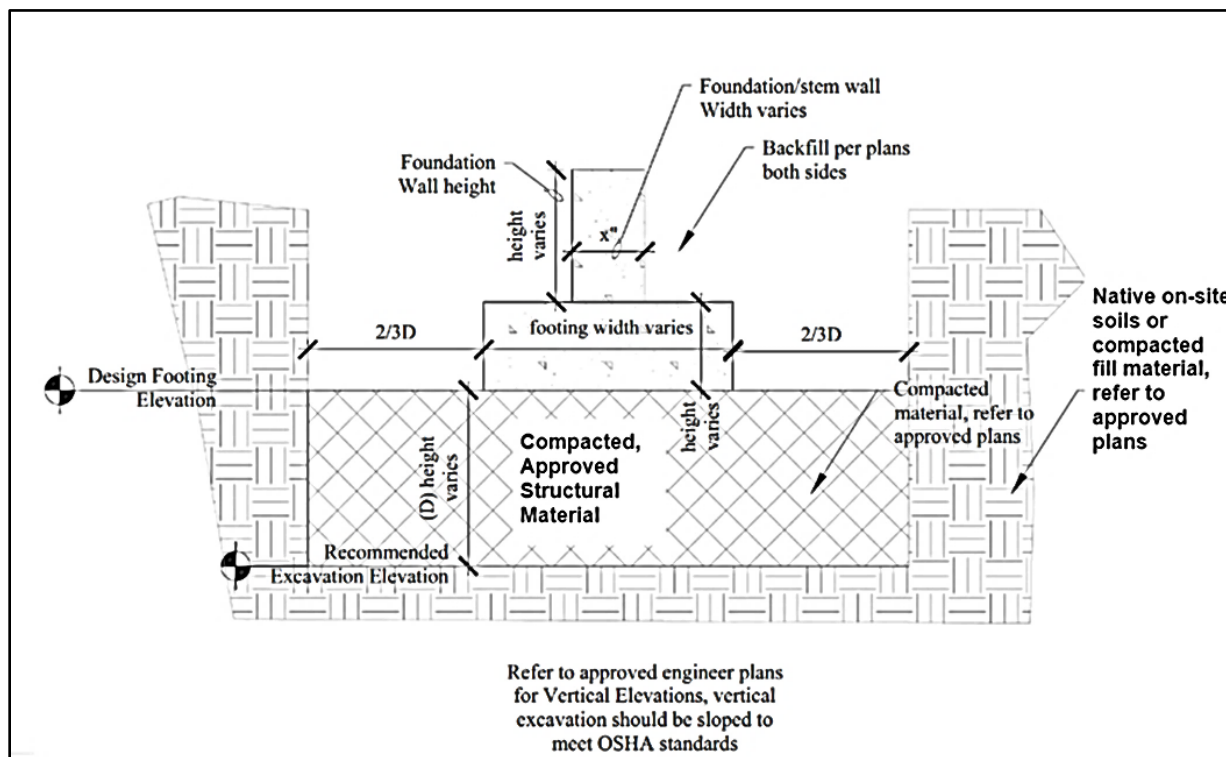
Foundation Trench Backfill Detail for Select Soil or Aggregate Base Course Fill
